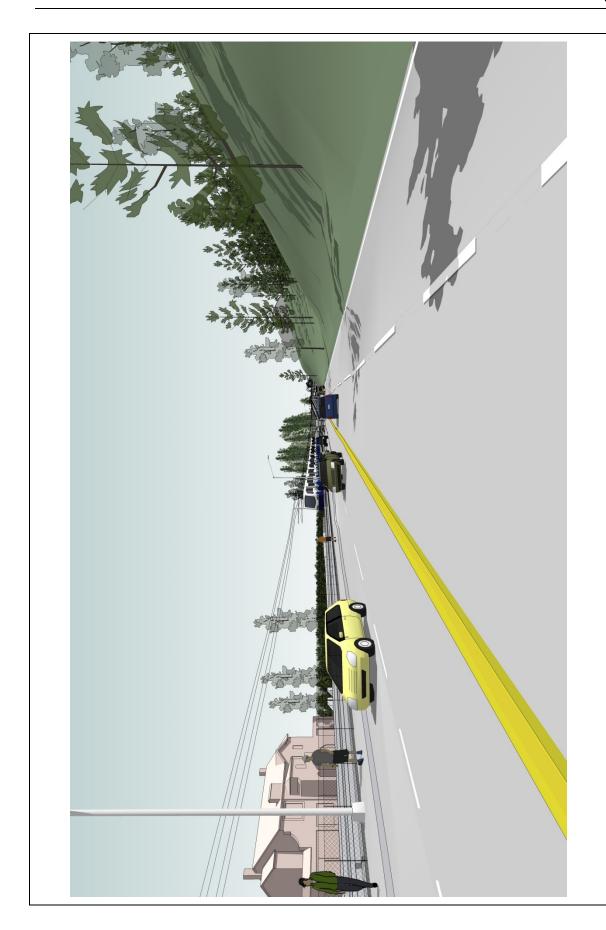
4: Relocate Winters House Street View Looking South —1b Cost Savings Idea
